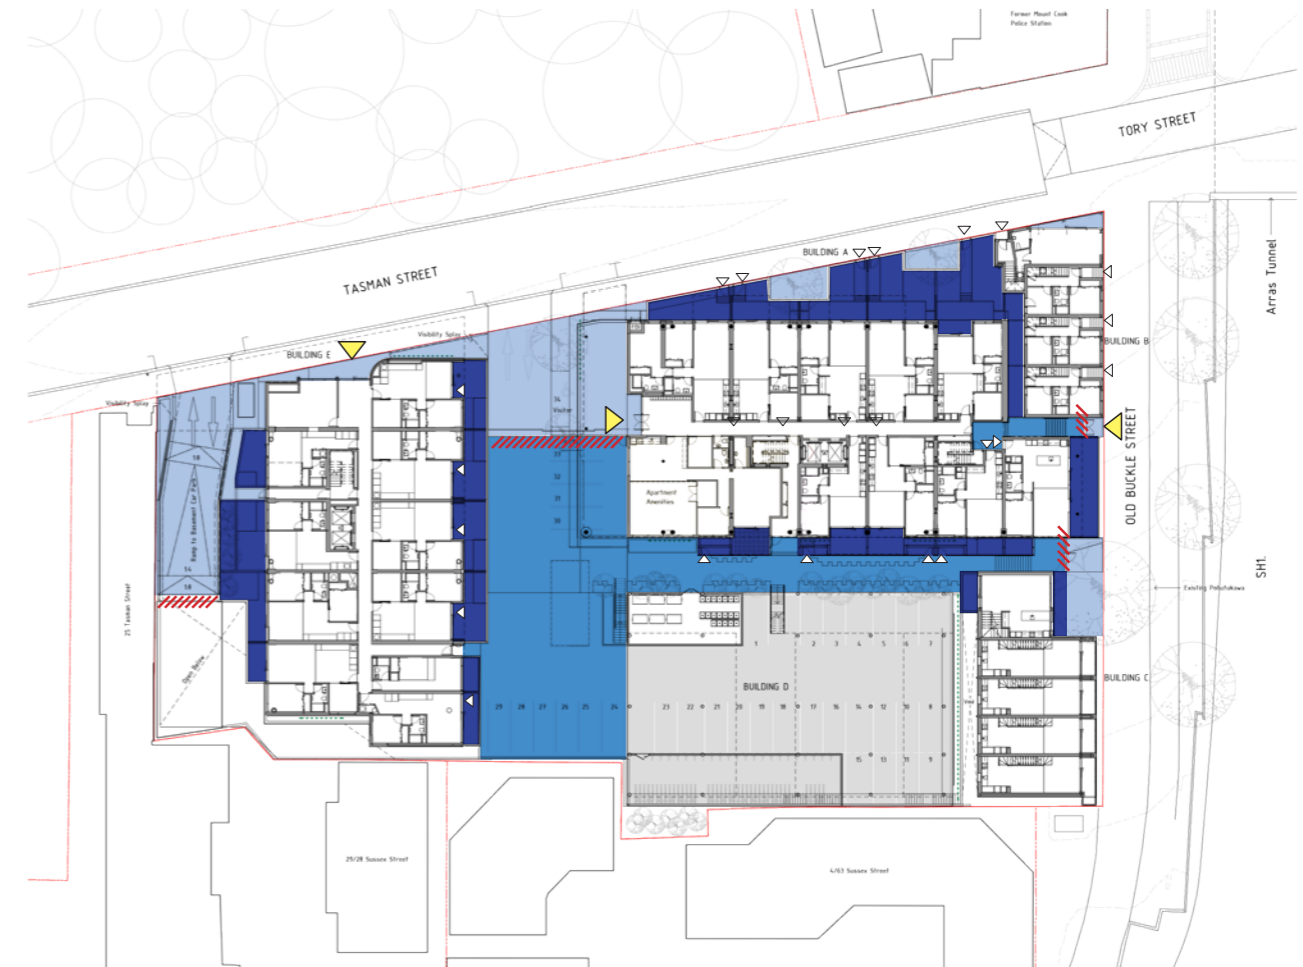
Ground Floor Plan 1:800 @ A3 - Refer also Landscape Plans by WA
